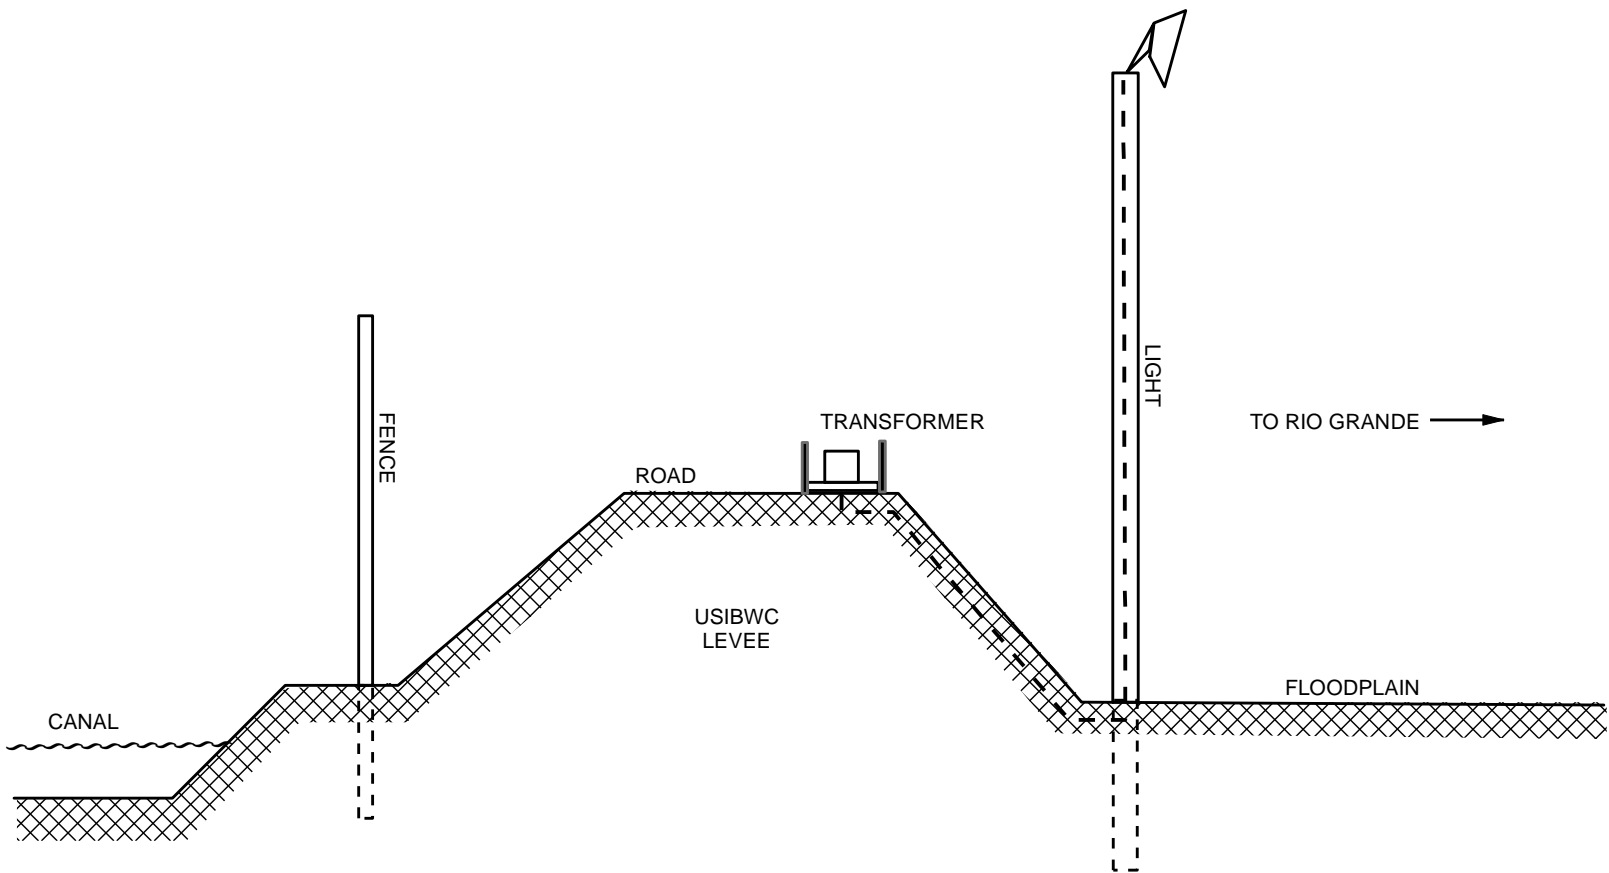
Typical Schematic Cross Section, Proposed Action
